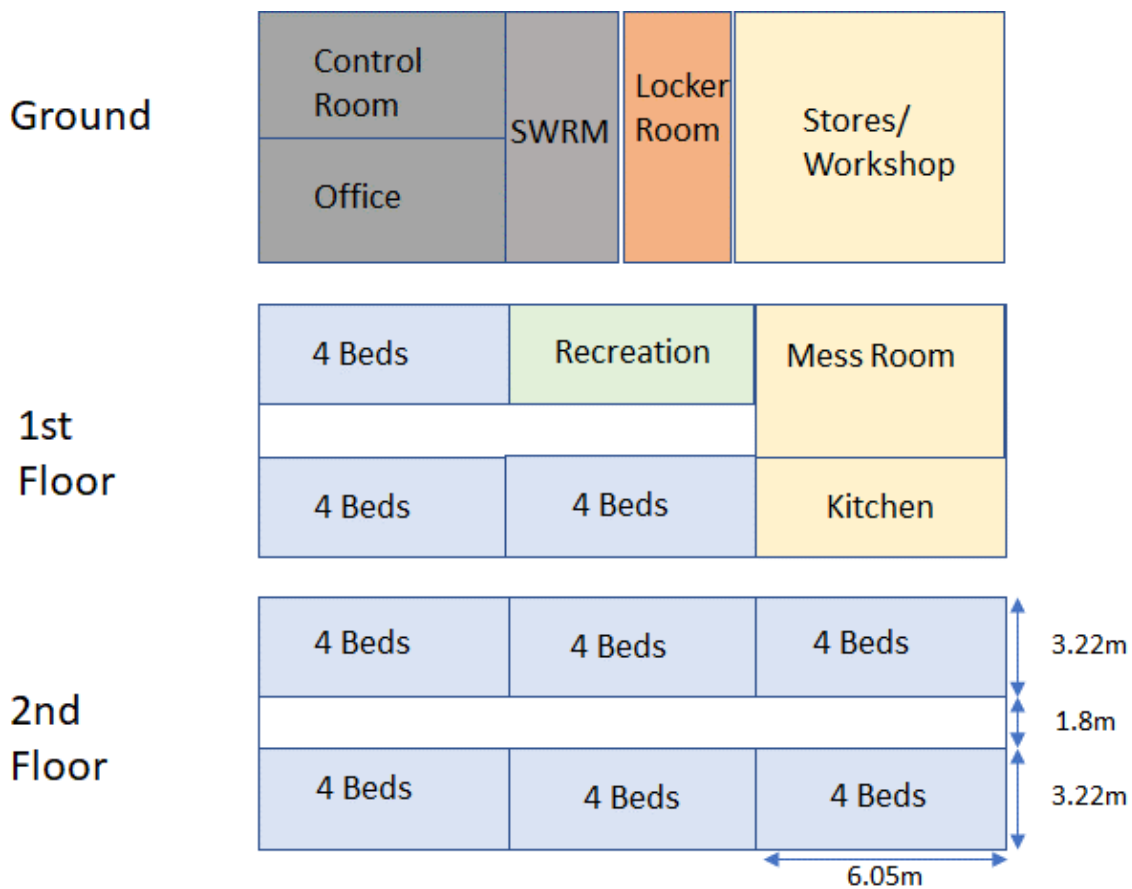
Assumed Accommodation Block layout (Plan view of 3 Floors)
